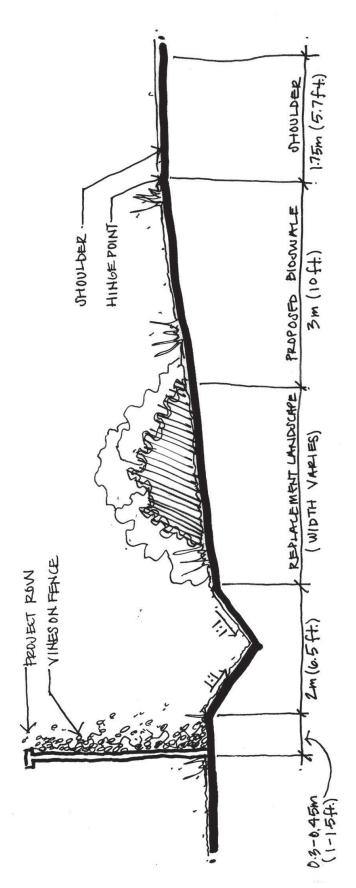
Typical Cross Section in Southwest Project Quadrant
